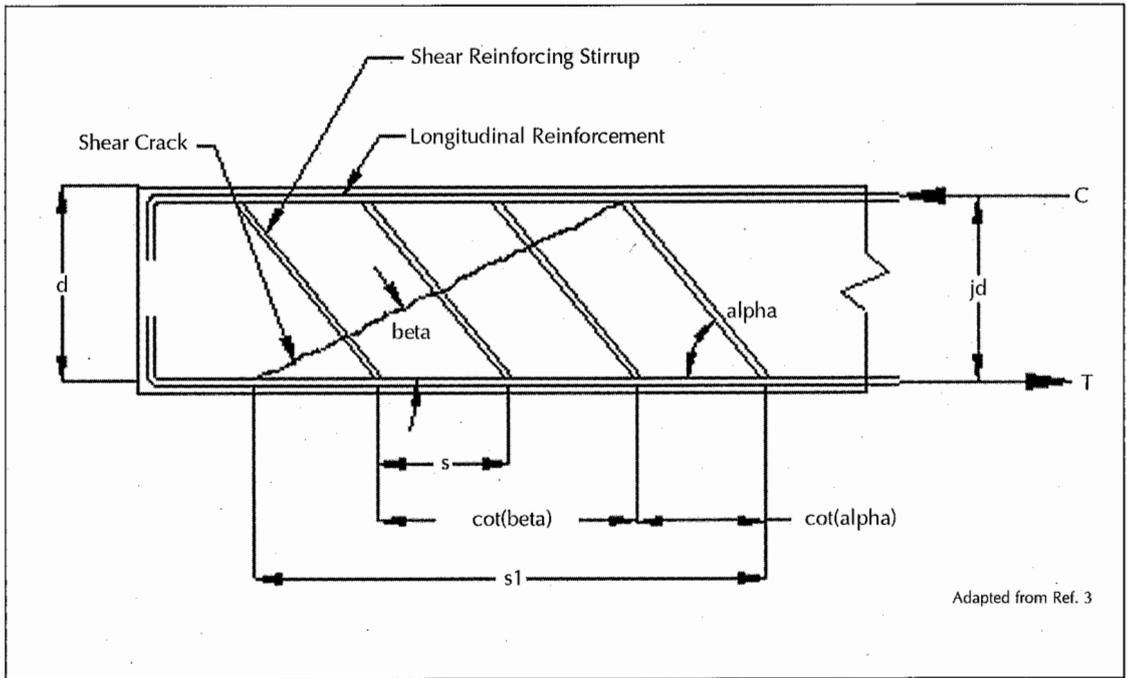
Schematic of a cracked shear-reinforced concrete beam.
